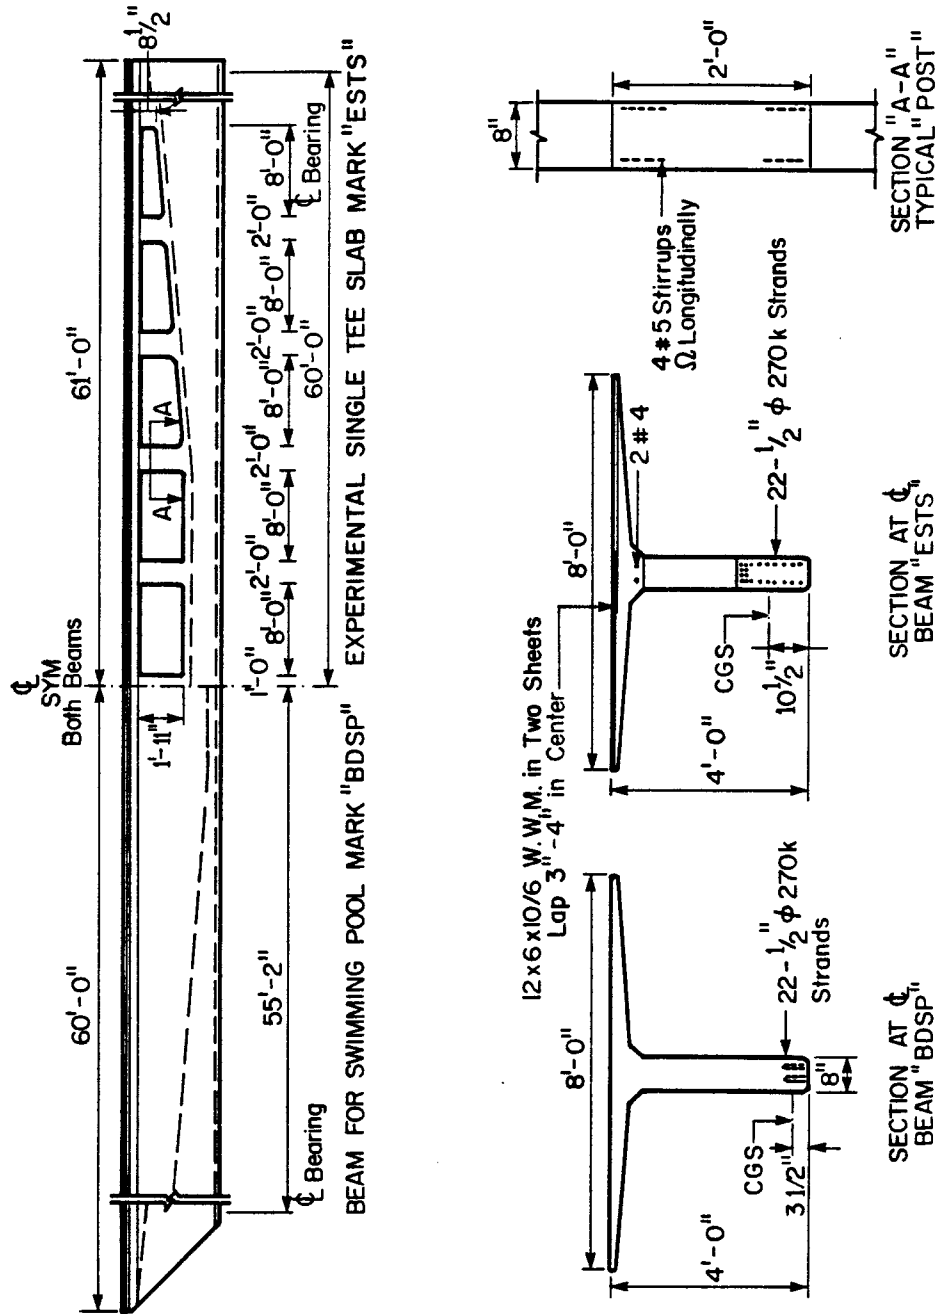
Details of Full Size Beam Tested by Ragan and Warwaruk.
